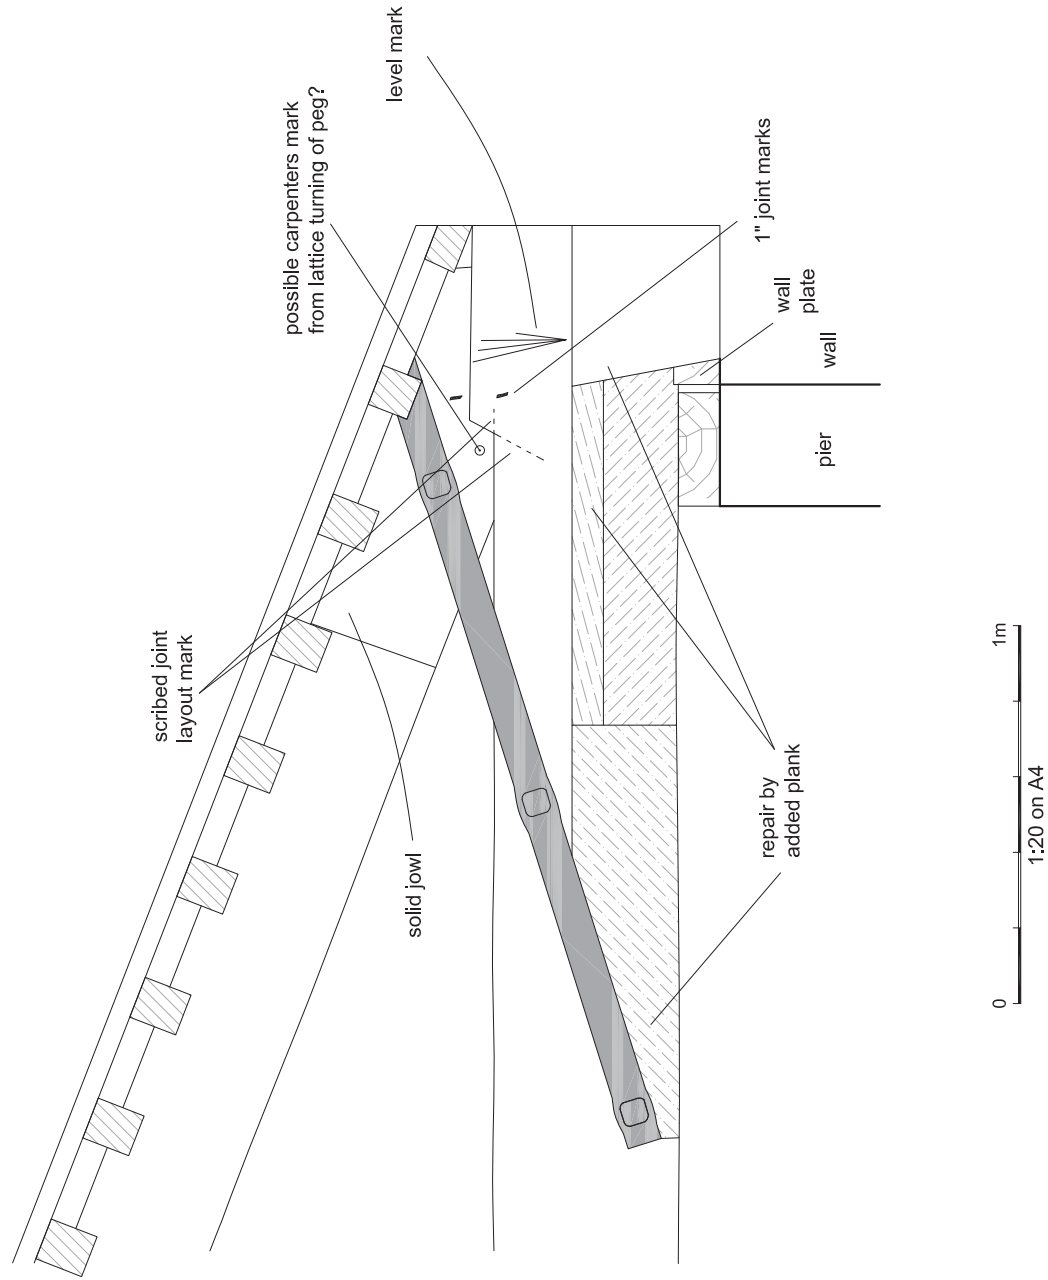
Detailed drawing showing the fine carpentry details surviving on the north end, east face, of Truss 1. The arrow shaped 'level' marks, scribed joint layout marks, chiselled combined truss and joint number marks and pit saw marks.
